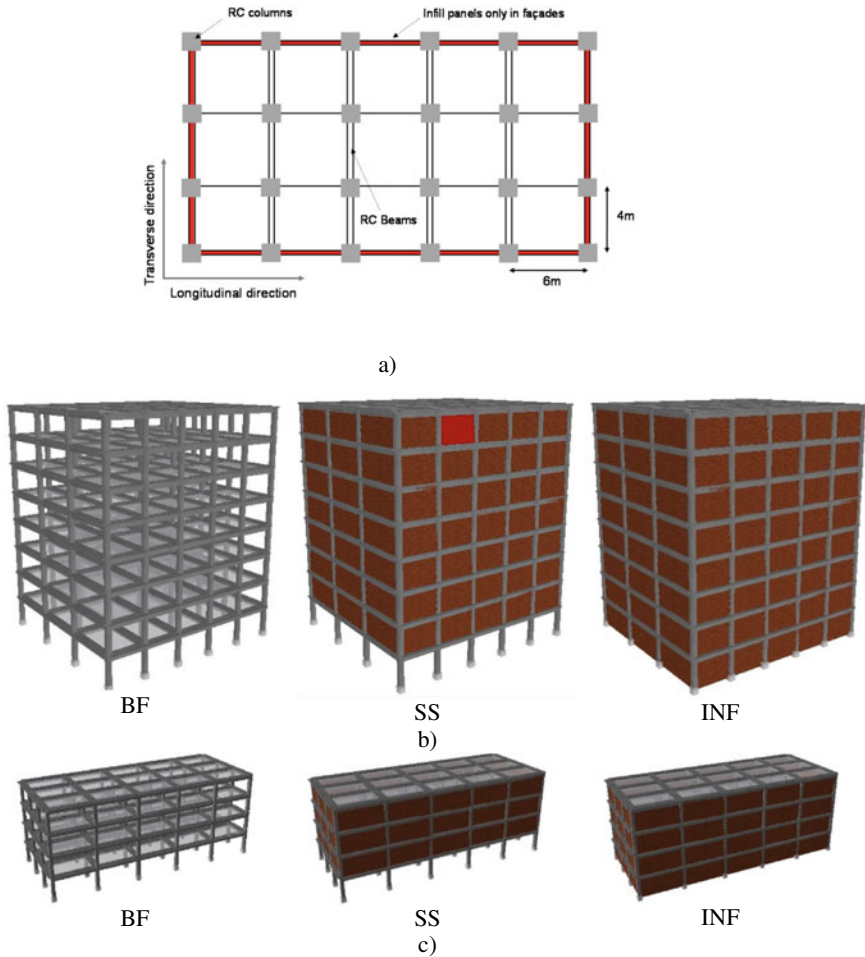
Case studies: a plan layout, b PT8, c PT4
